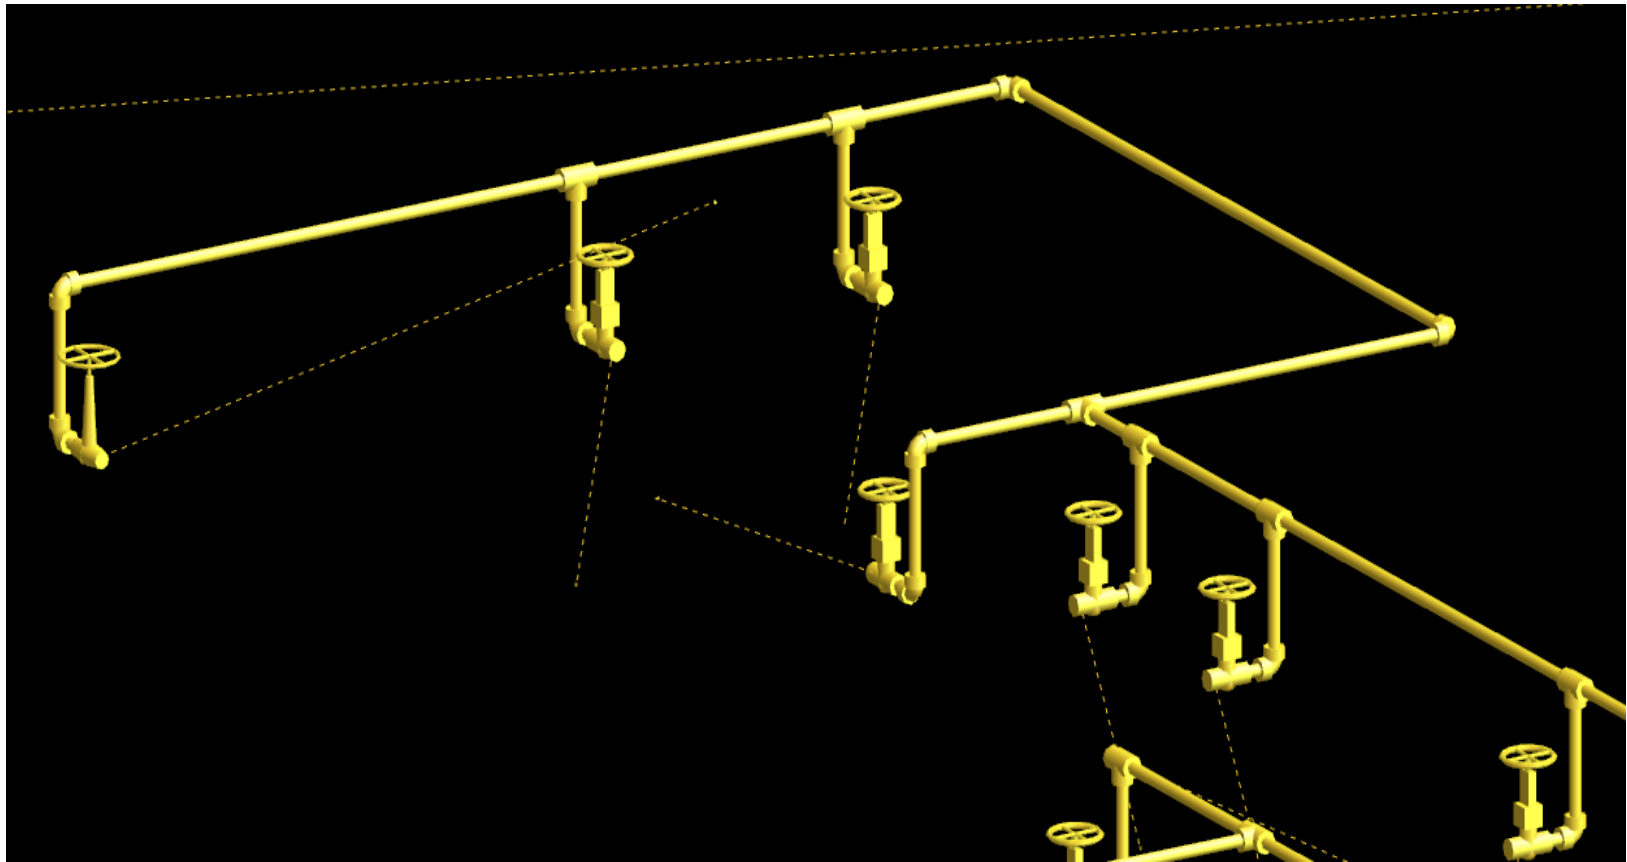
Tubing layout at Biotech Lab 2 (3D review)
